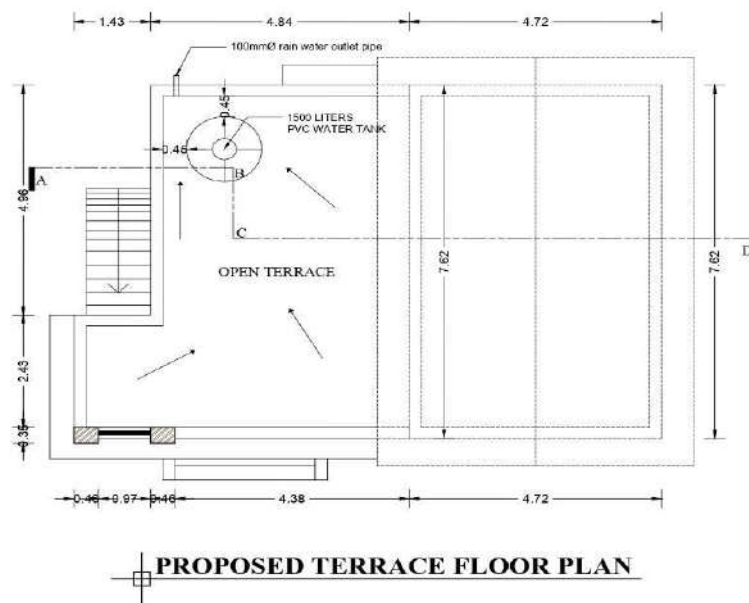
Anganwadi Terrace Floor Plan
